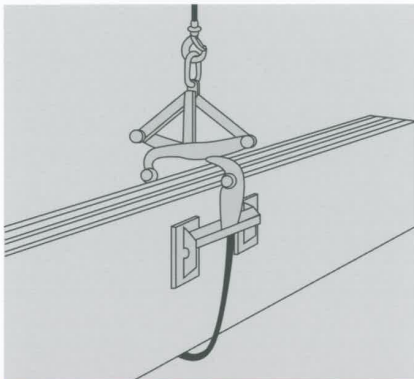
Lifting gear (Hebel® horizontal wall panels).
